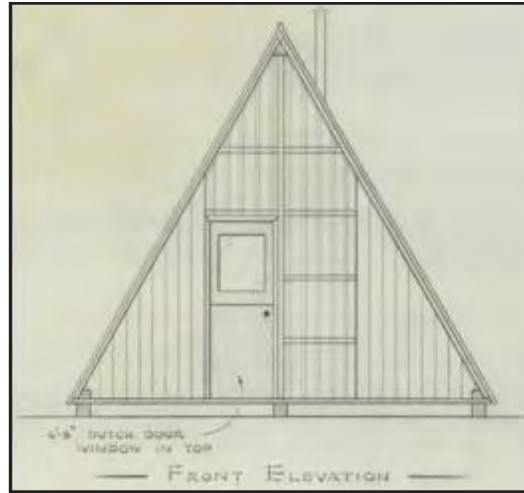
Front façade detail from Outlying Cabin Plate 29L 1963.
